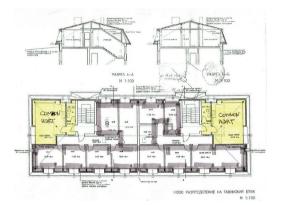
| Roof reconstruction plan of the pilot building (credit: G. Georgiev).
